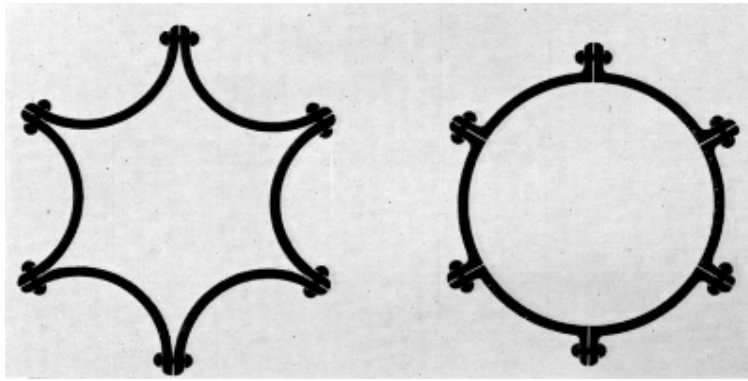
Left*: conjectural section of Bollman's segmental wrought-iron column, about 1860, and section of the standard Phoenix column; *right*: Phoenix column as used in truss-bridge compression members.
